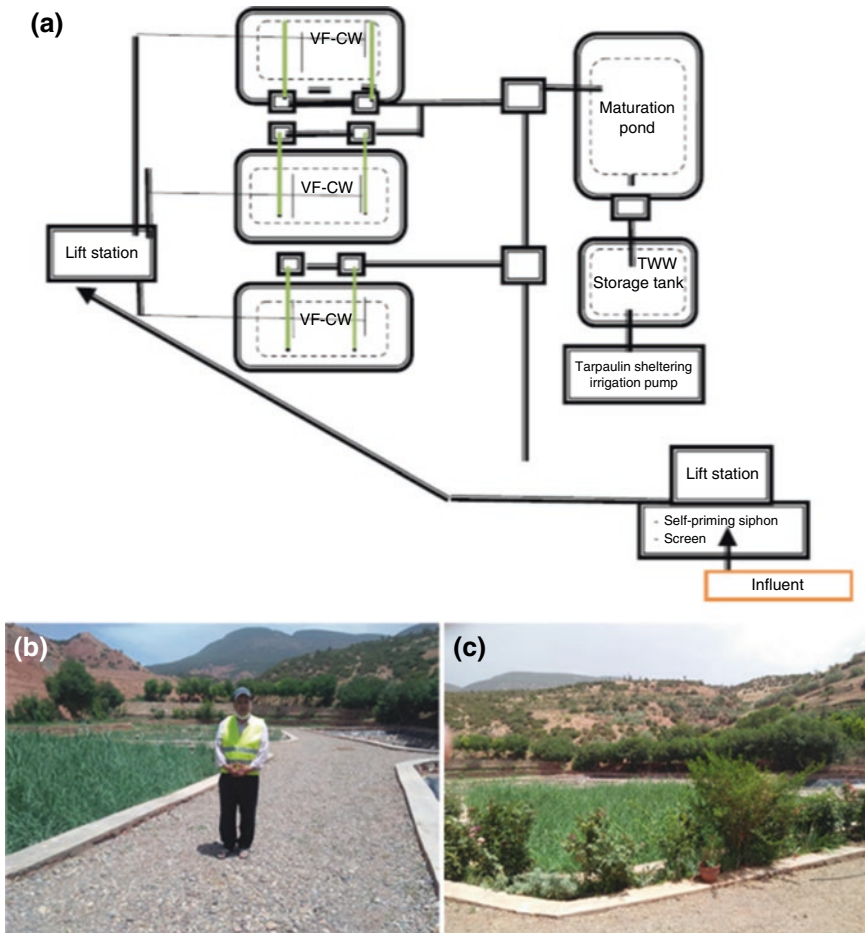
(a) Schematic layout of the Asselda village's wastewater treatment plant; (b) aerial view of the plant and; (c) irrigated trees area.
